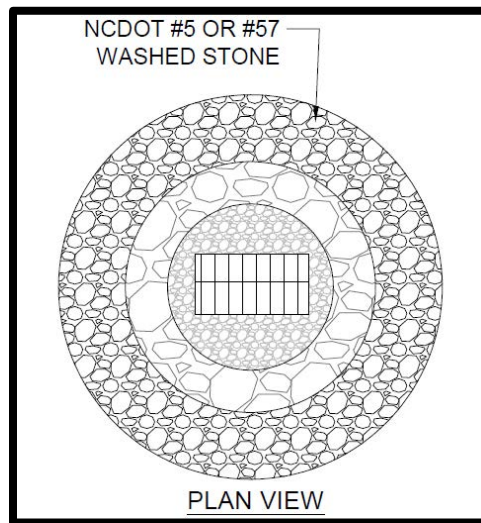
Rock Ring Drop Inlet Protection Plan View.
